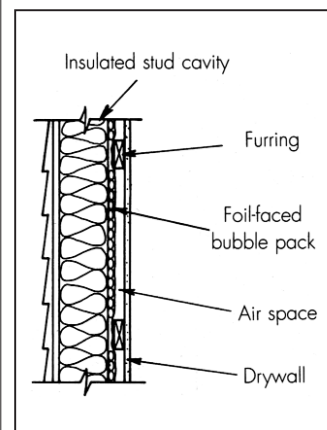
Stud wall installation with single air space. The bubble pack is stapled to the studs, followed by furring or strapping to create an air space behind the drywall. The bubble pack with air space adds about R-3.5 and serves as a strong and effective vapor retarder.
